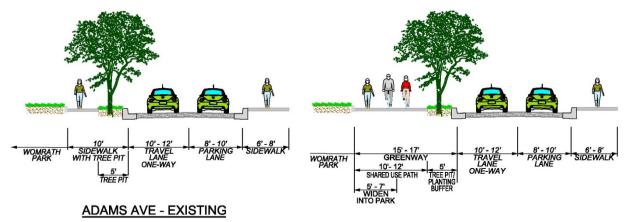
Adams Avenue Cross Section looking south toward Frankford
